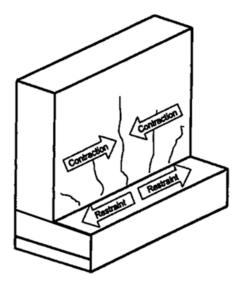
Restraint of a concrete member by an adjacent element (adapted from Bamforth 2007)
